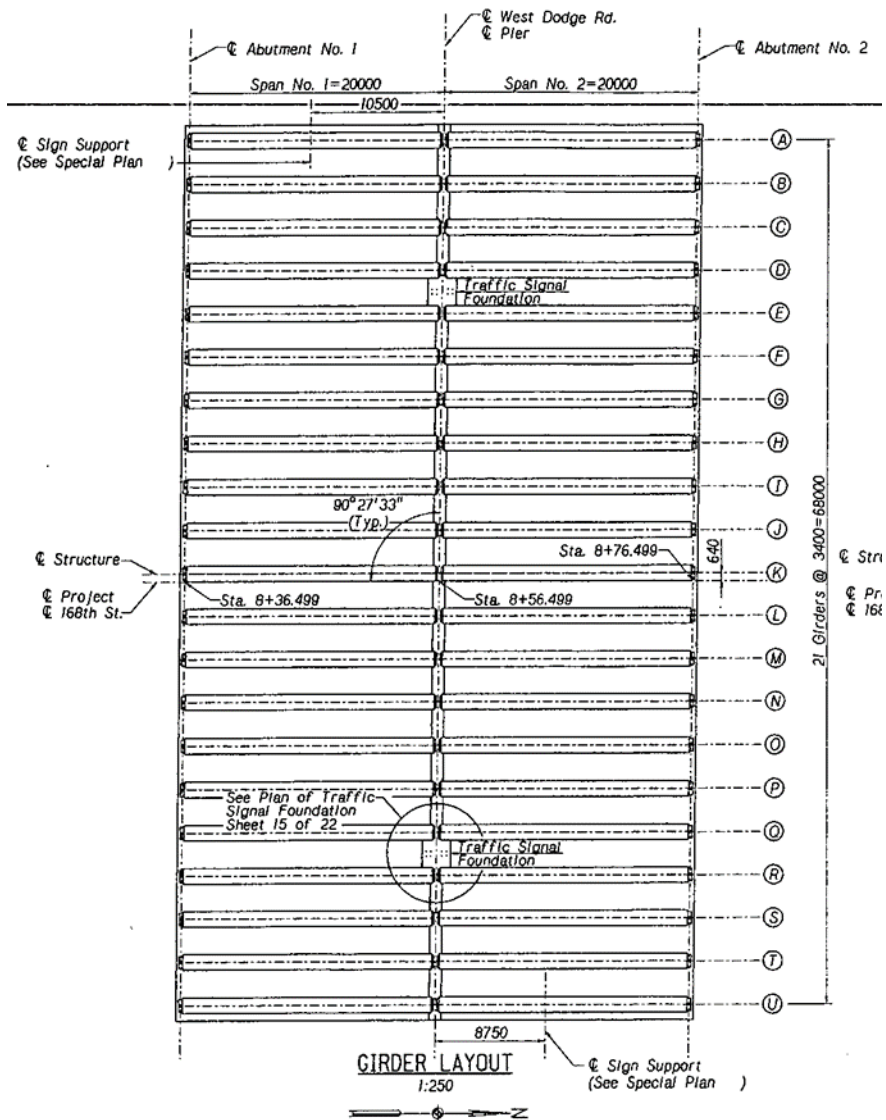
Plan view from the construction documents of 168th St. over West Dodge Road Bridge system, courtesy of NDOT
